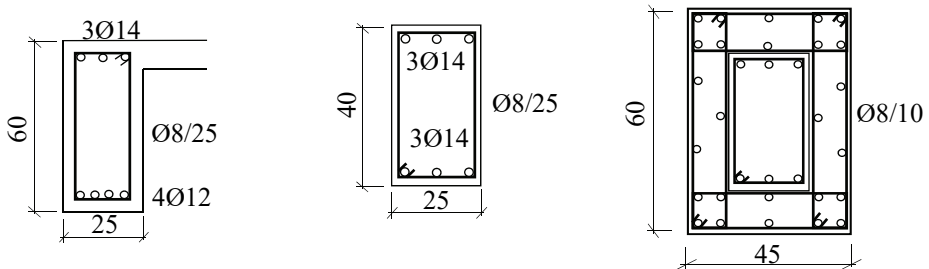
Sample Sections for Existing Beam, Column and Retrofitted Column
